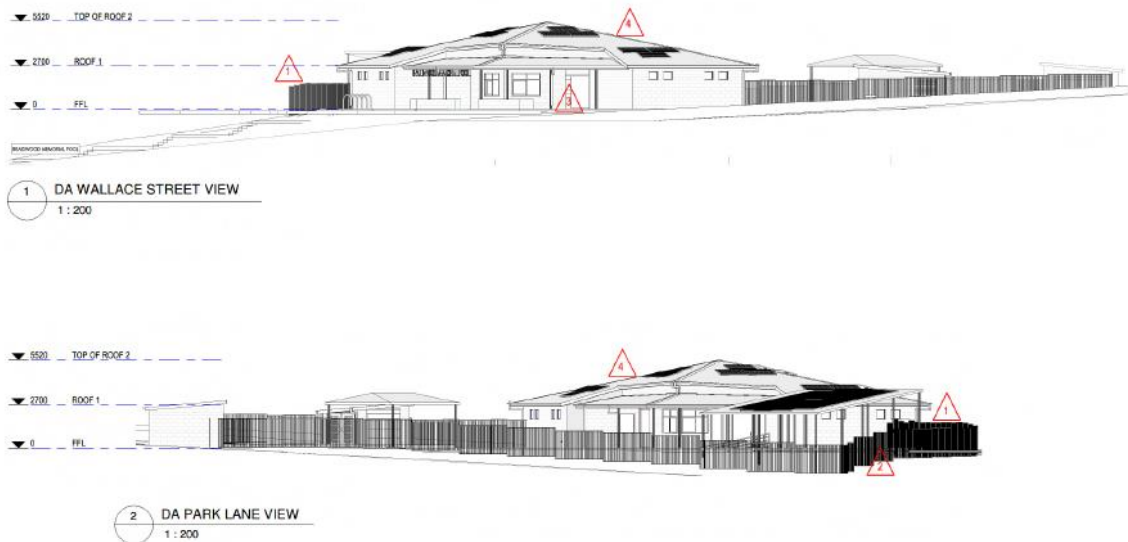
Proposed External Street Elevations (Prepared by Paul Barnett Design Group)
